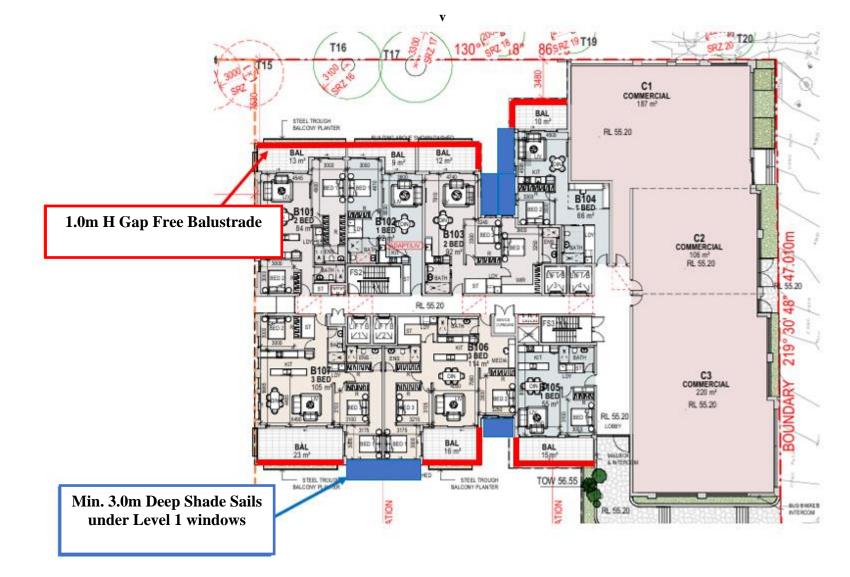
Proposed Sound Barrier Locations & Shade Sail Location - Level 1
